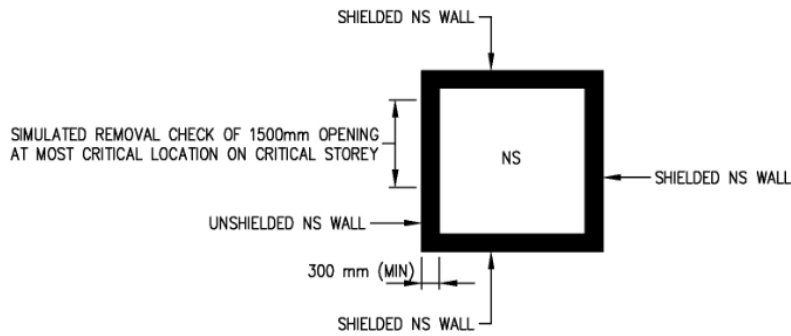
B(i) : UNSHIELDED NS WALL OF SS TOWER
